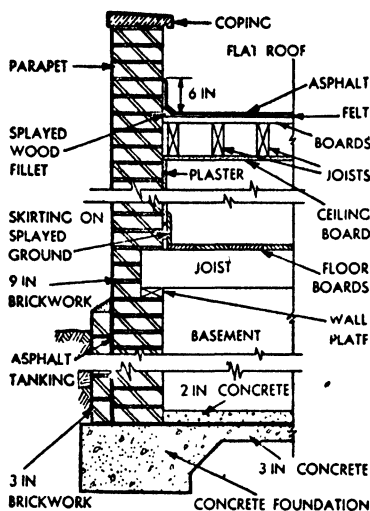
Asphalted finish to flat roof and tanking of basement without areas, showing continuity of floor and wall dampcourses on concrete foundation.
